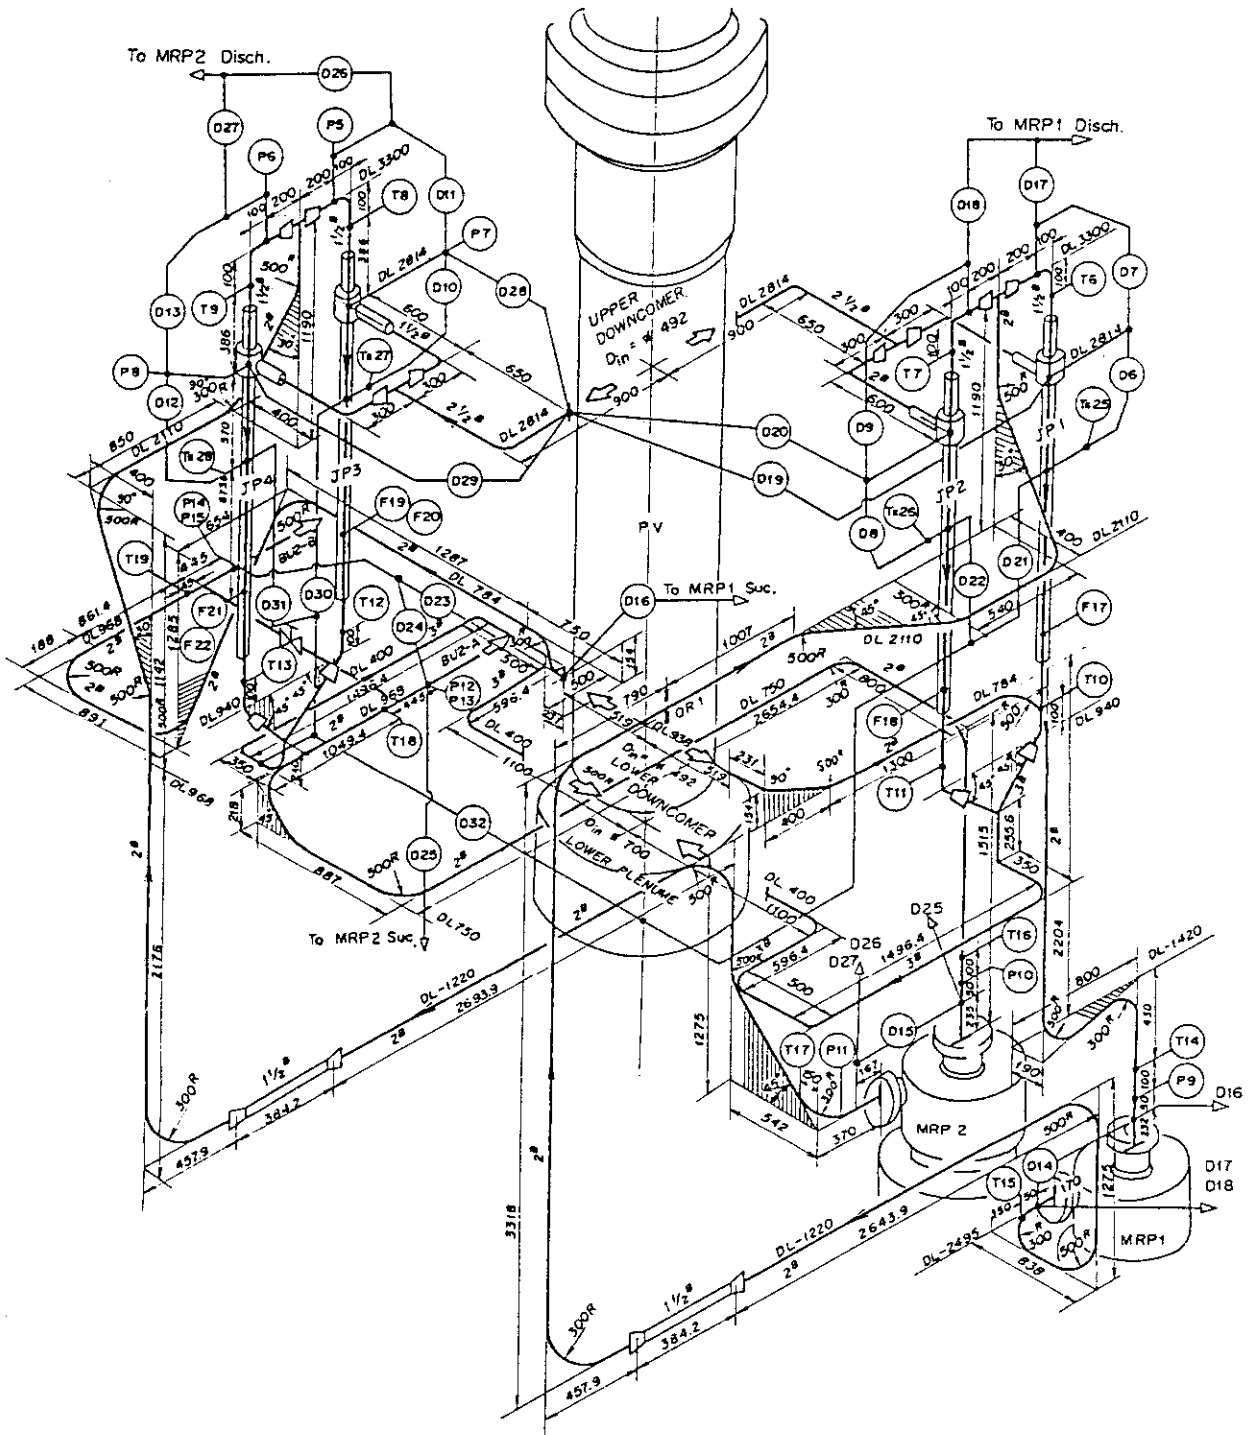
Piping Layout of Recirculation Loops and Jet Pumps
